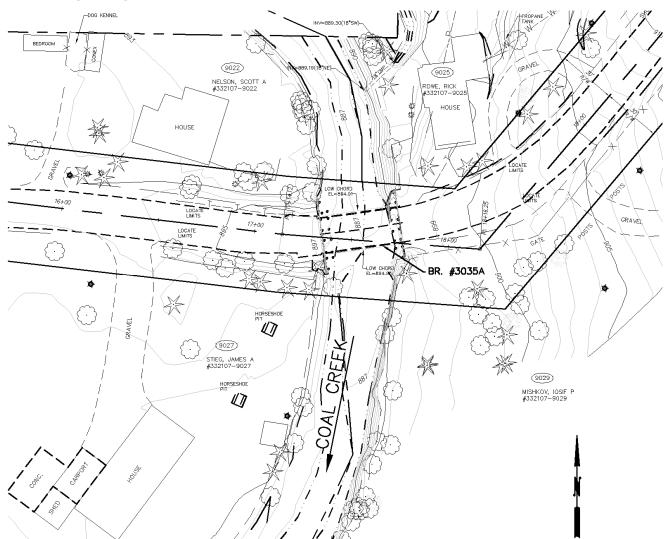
Survey basemap of SE Lake Walker Road at existing bridge #3035A. Coal Creek flows from North to South (top to bottom) through the bridge.
